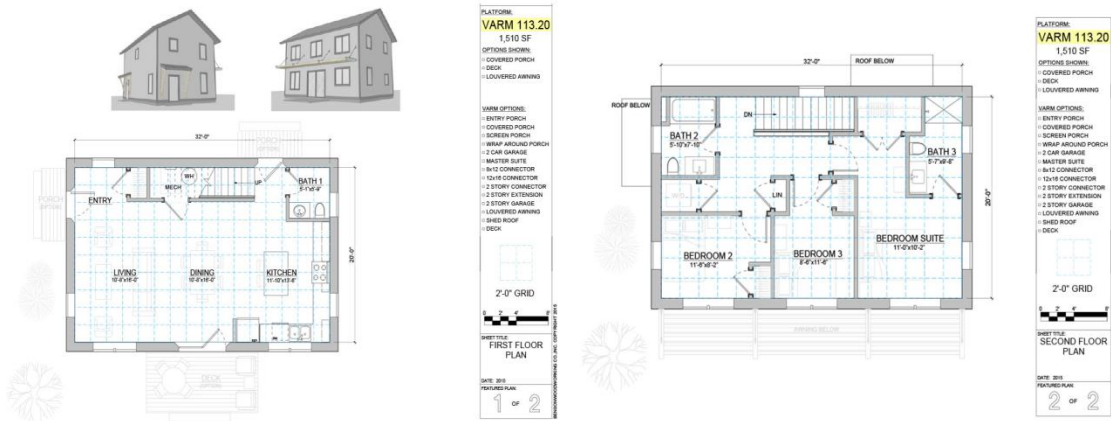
Värm First (Left) and Second (Right) Level Floor Plans
